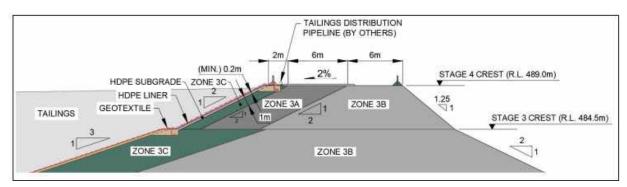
Typical Section IWLTSF Stage 4 South Embankment (REC, 2025)
